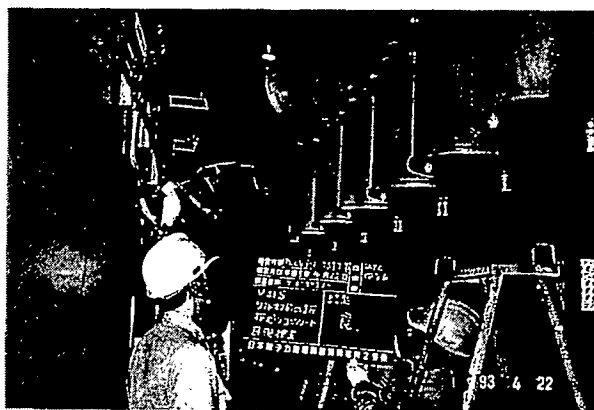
Visual Inspection on T/G Concrete Surface (GT-2)
